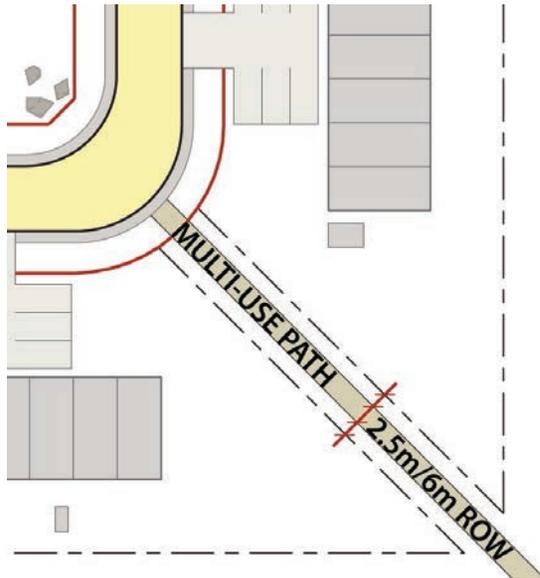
Multi-use trails (e.g. pedestrian, snow machine, ATV) should be a minimum of 2.5 metres in width and be located within a minimum 6.0 metre right-of-way. Drainage ditches can be incorporated into the rights-of-way for multi-use trails; however the right-of-way may need to be widened.
